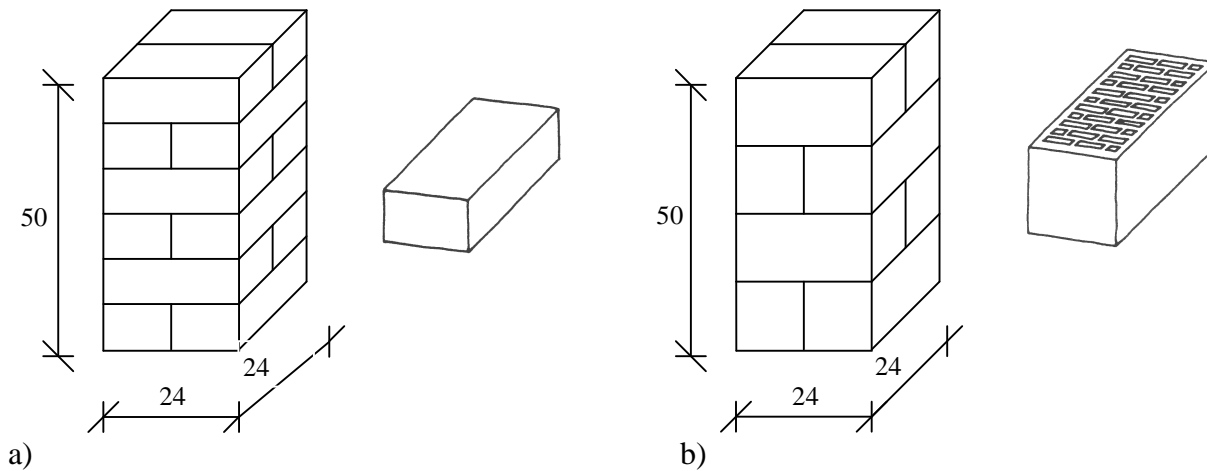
a) Masonry specimen type A, b) Masonry specimen type B, dimensions in cm
